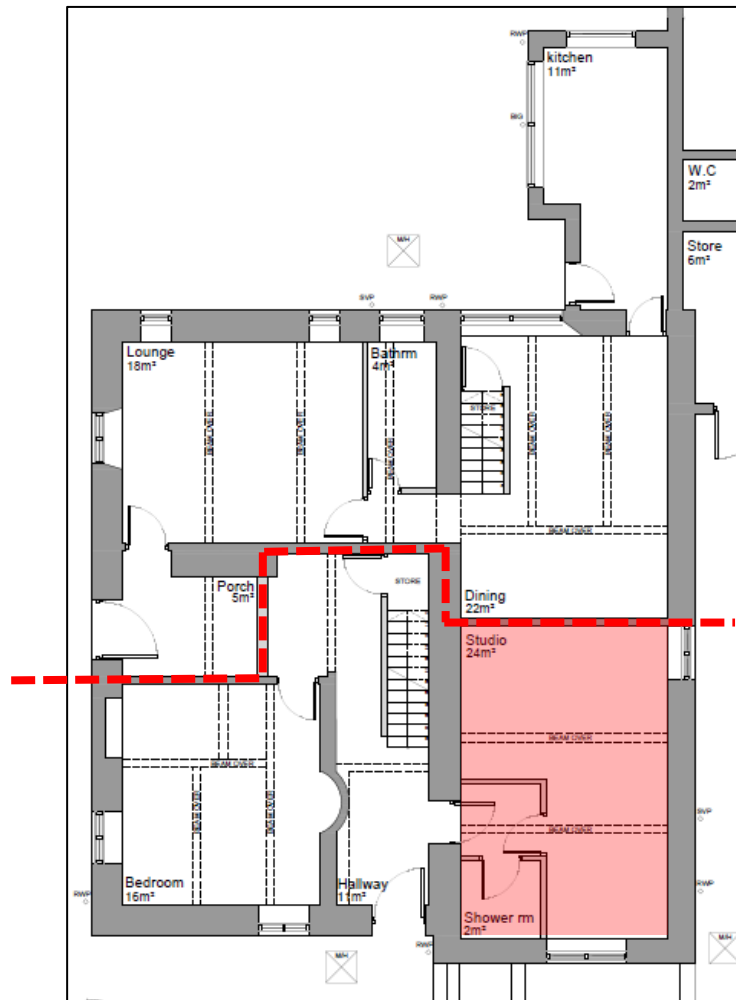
Ground floor plan of 8-10 Shawbridge Street (red dotted lines show the division between No. 8 and 10; red shaded area was the bedsit)
